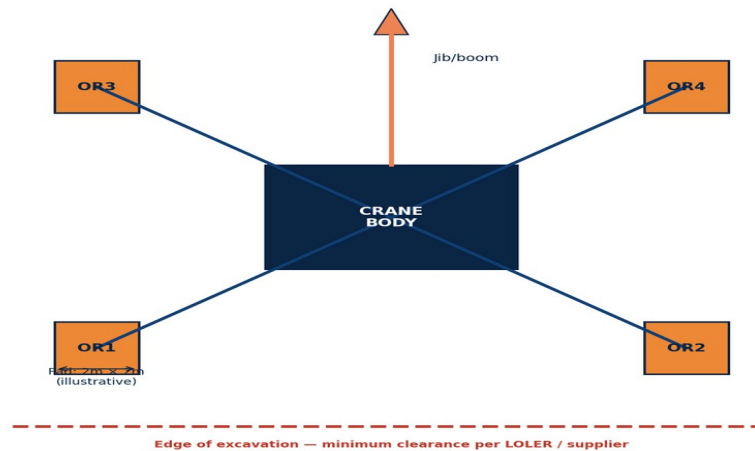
Mobile crane outrigger arrangement in plan.
